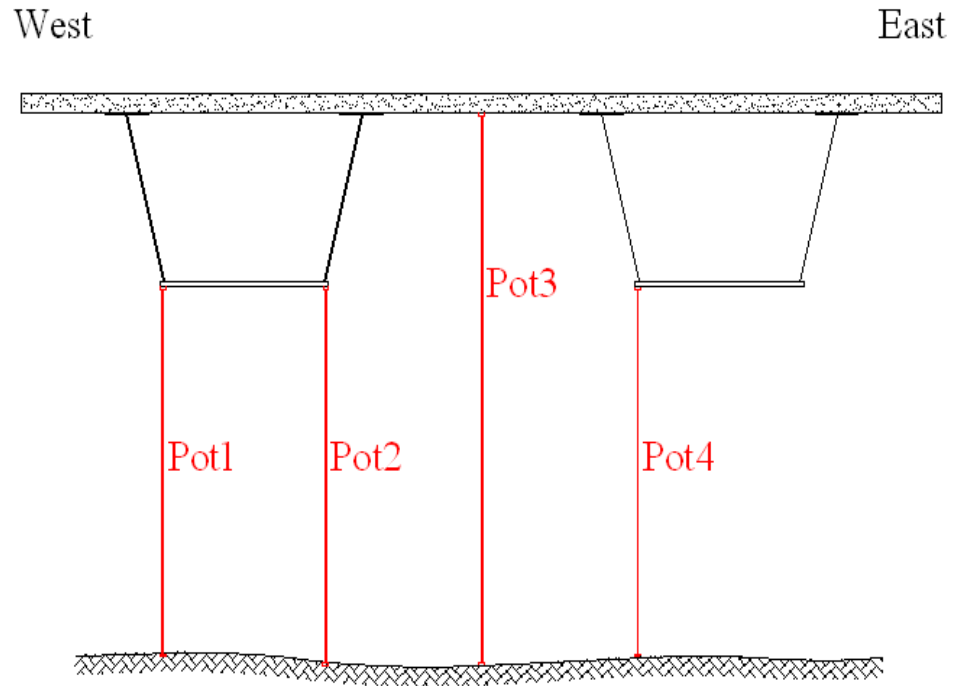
Arrangement of potentiometers at Location 1 in the first span.
